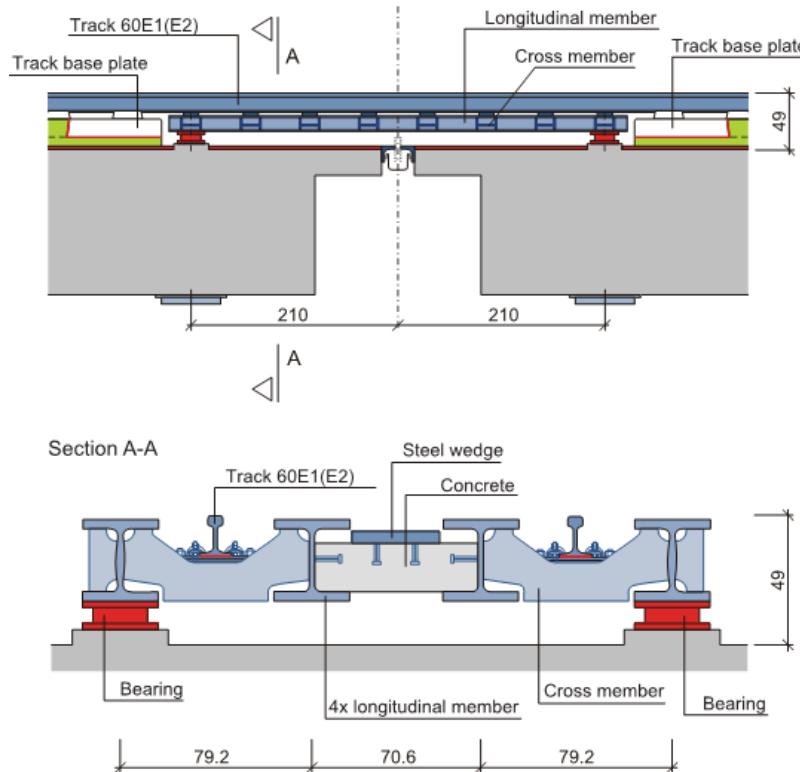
Track-crossing construction, (PORR Group, 2017).
